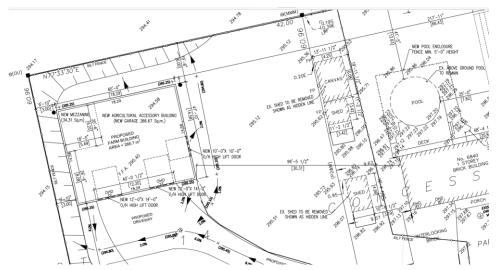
Proposed Site Plan (Expanded View of Proposed Accessory Building)
